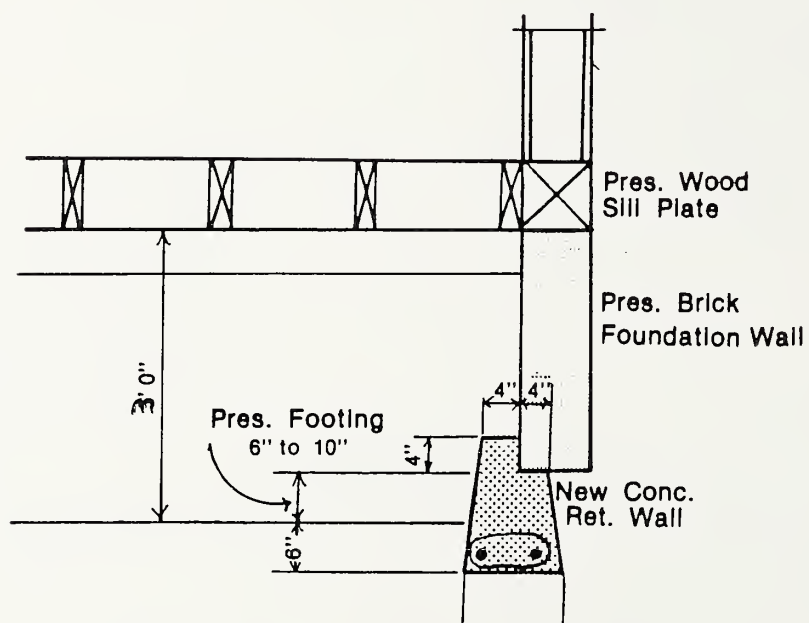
Lincoln Home, Specifications for Concrete Retaining Wall Located Beneath 19th Century Brick Wall (Courtesy of the National Park Service).
